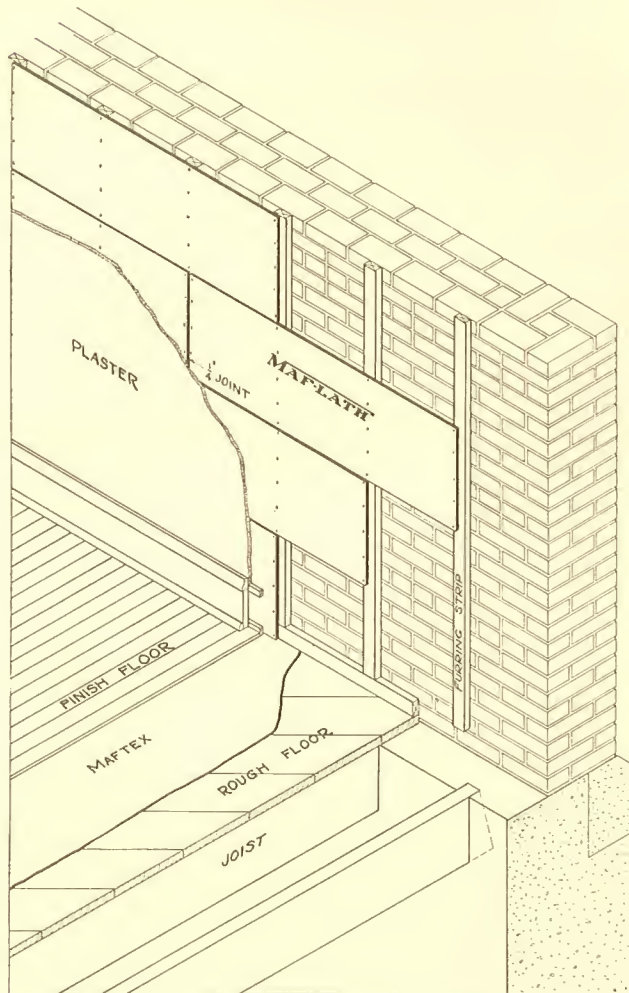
MAF-LATH applied to furring strips on the interior of a masonry wall.
